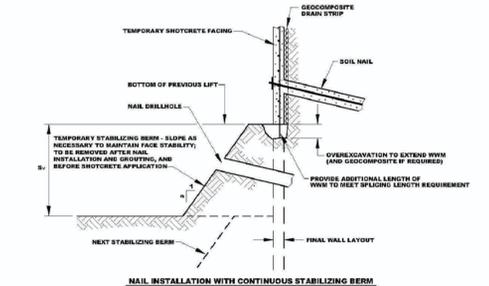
(a): Examples of Alternative Temporary Excavation Support: Stabilizing Berm. Modified from Porterfield et al. (1994).
